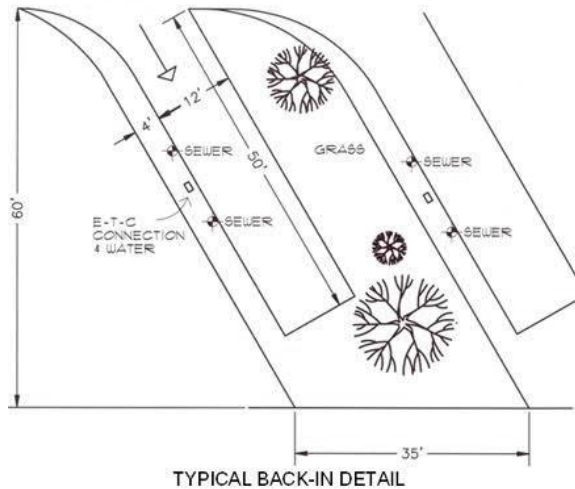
Campground Typical RV Site Back-In Detail
